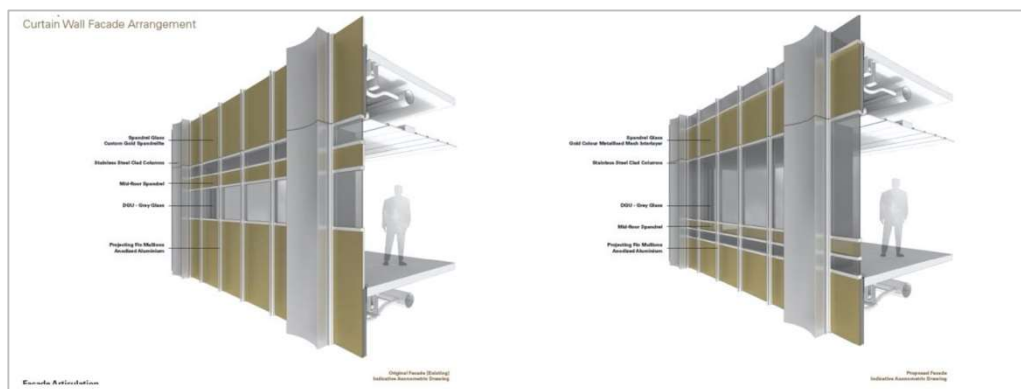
Details of the existing (left) and proposed (right) curtain wall façade (Source: Urbis HIS 2017, 6)
